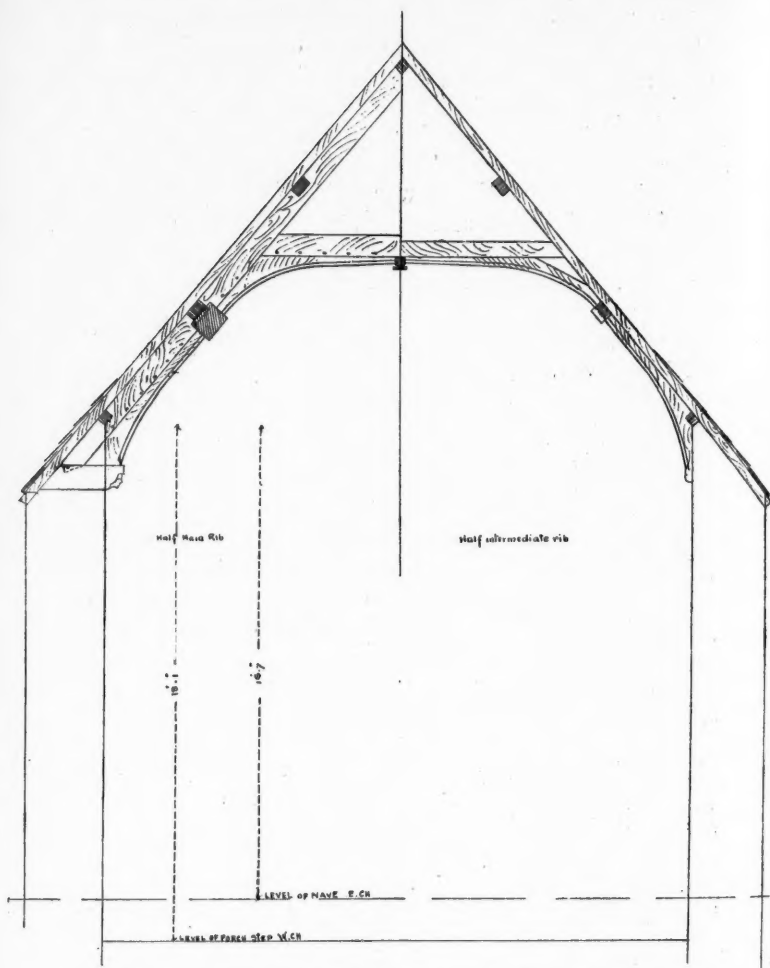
Western Church at Llantwit Major: Cross-section, showing roof.
